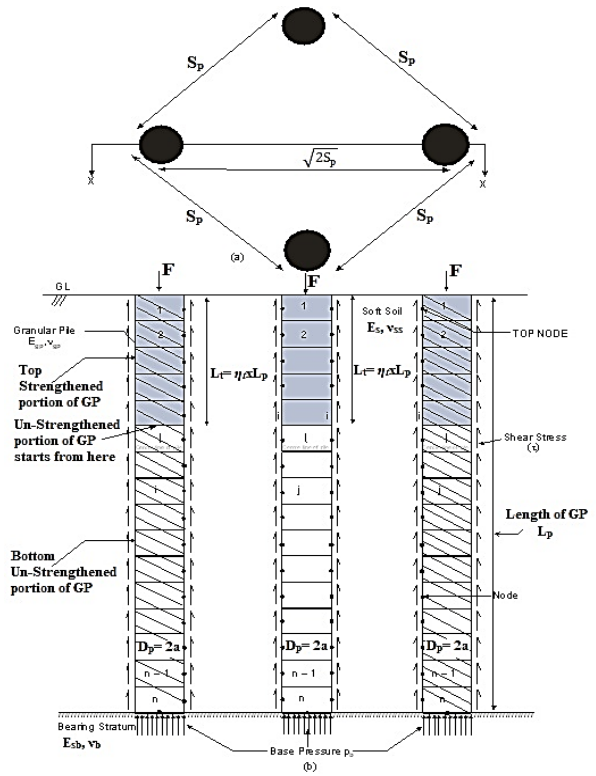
(a) Plan of a set of four uniformly positioned partly strengthened end bearing GPs, (b) Front view sectioned at X-X of a set of four uniformly positioned partly strengthened end bearing GPs
